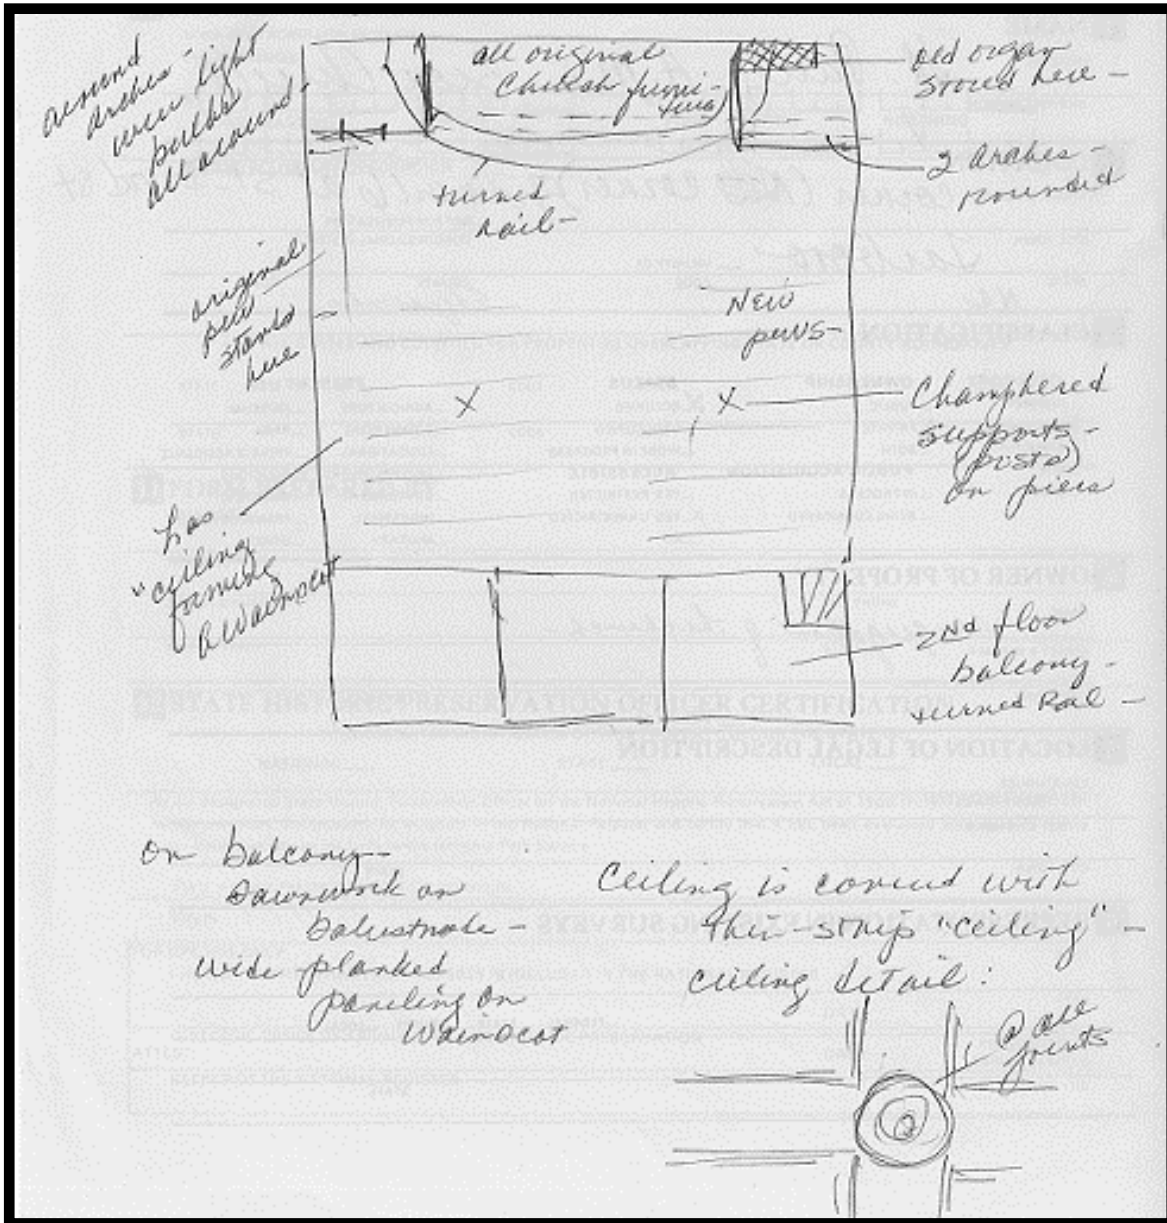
Plan and Ceiling Detail of St. Paul AME Zion Church Before Flood (NCHPO Survey File, ED0055).
